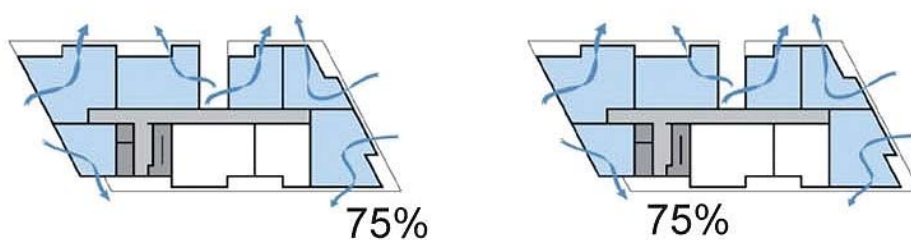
Use of design features to enhance cross ventilation at detailed design stage.
